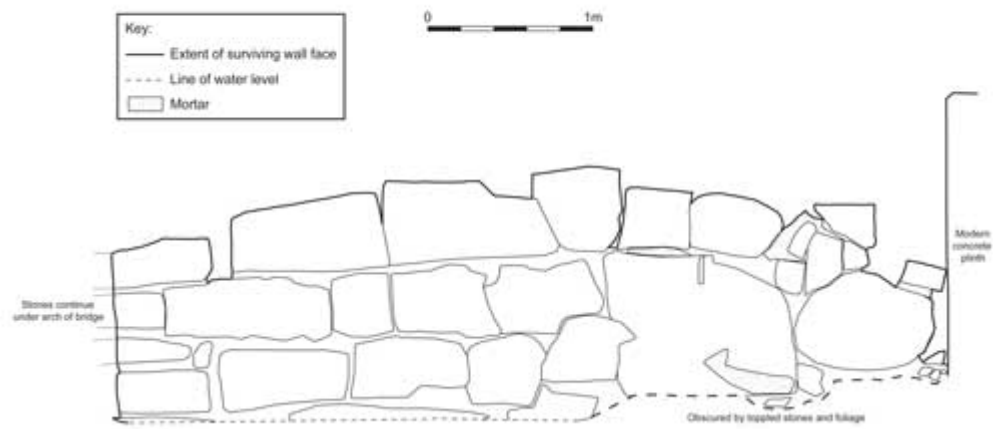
; Structure 3, Rusticated Bridge #1 (Upper Bridge): Elevation f
